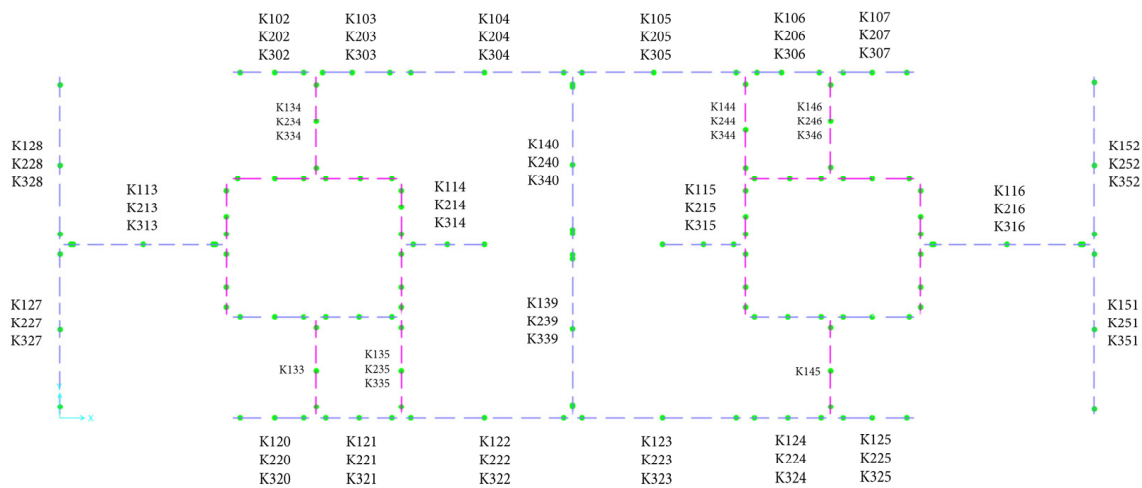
SAP2000 analysis model floor plan, beam plastic hinge layout.
